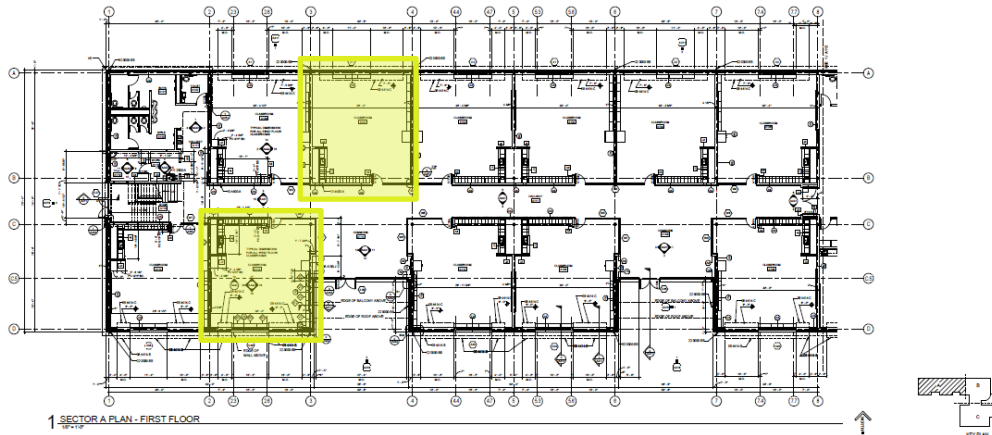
First Floor- Selected Classroom 1 (South) and Classroom 3 (North). (Provided by Pivot Architects)
